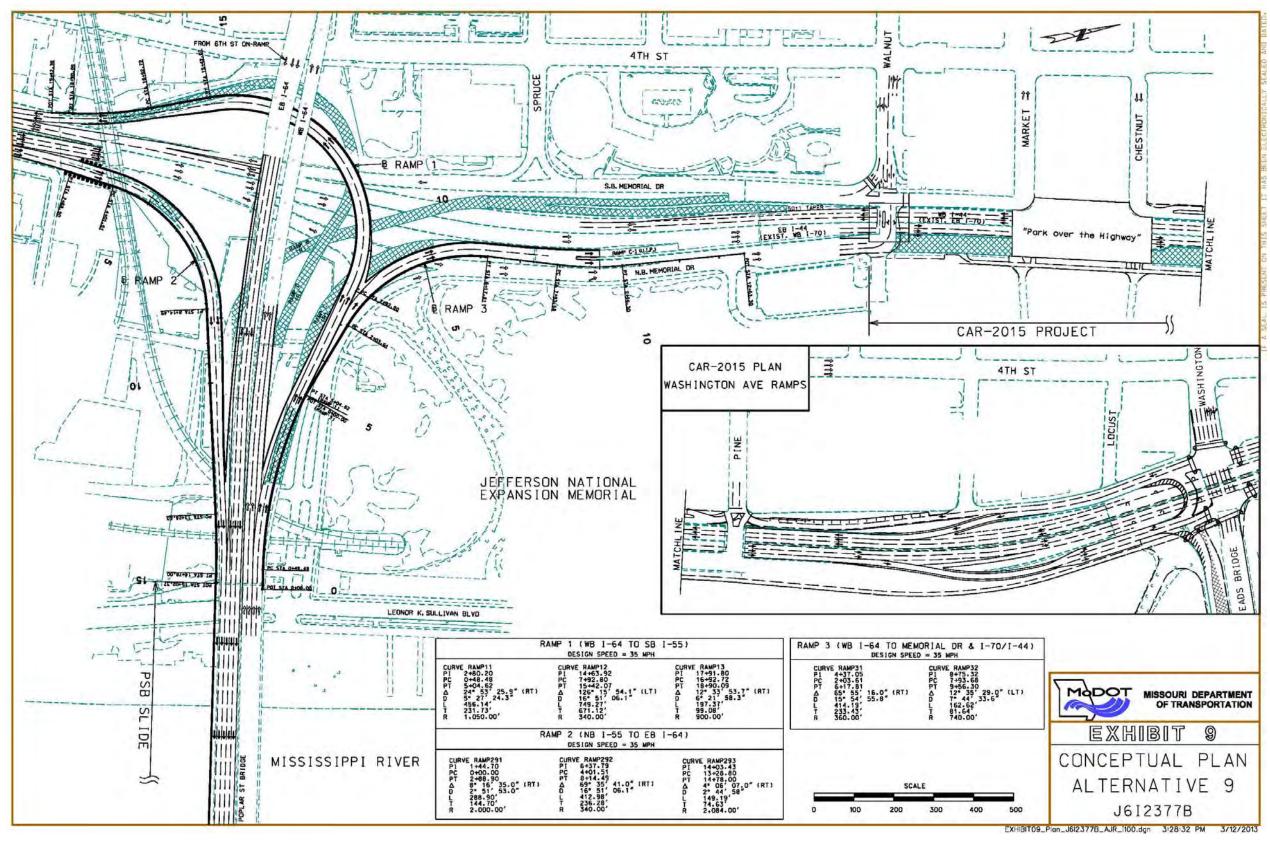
PSB Interchange Reconstruction Preferred Alternative (Alternative 9)
